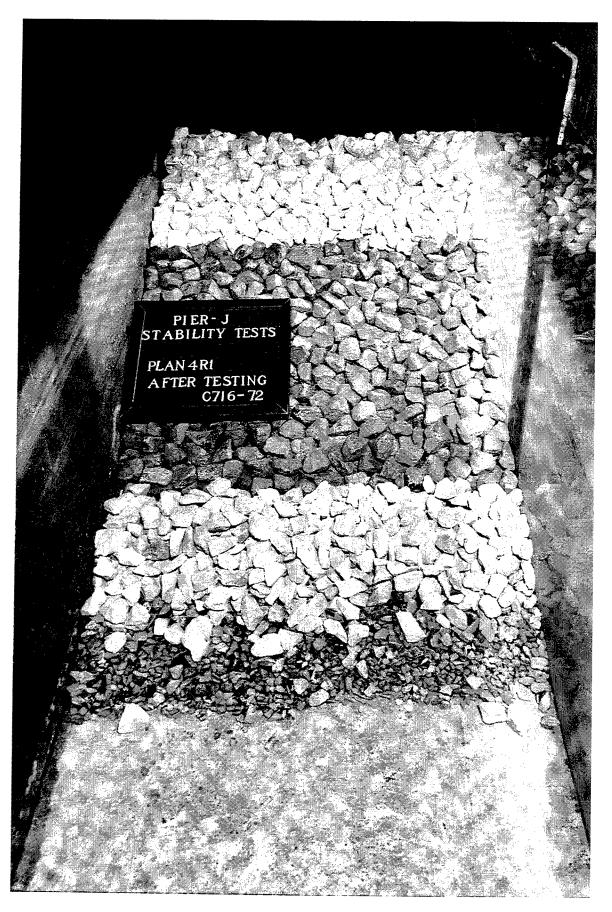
Sea-side view of Plan 4R1 at the conclusion of testing
